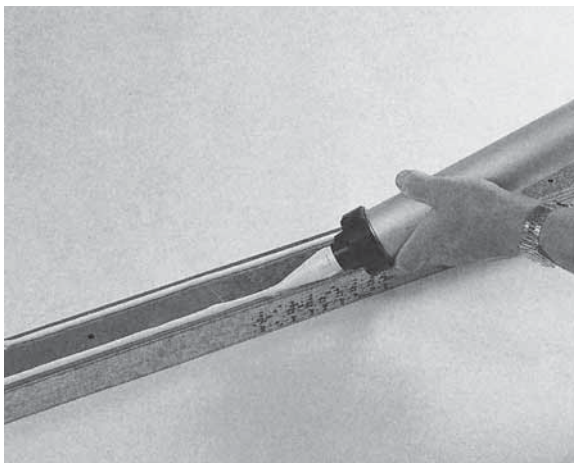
Acoustical sealant application with application extrusion application on a connection profile
